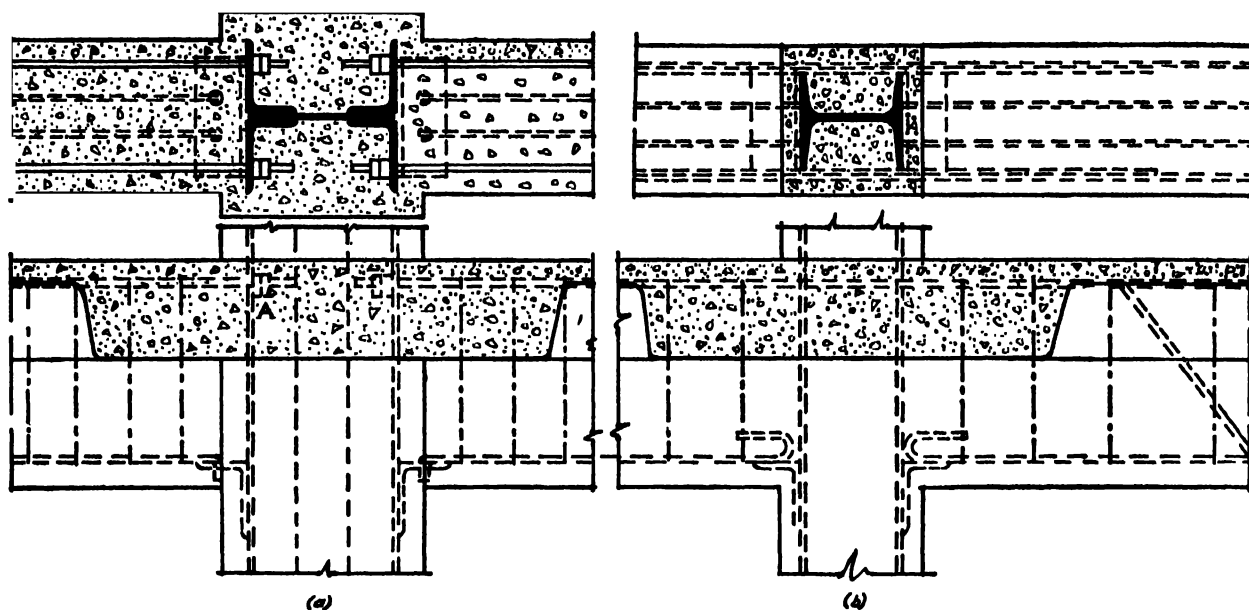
SUPPORT OF CONCRETE GIRDERS AT STRUCTURAL STEEL COLUMNS
